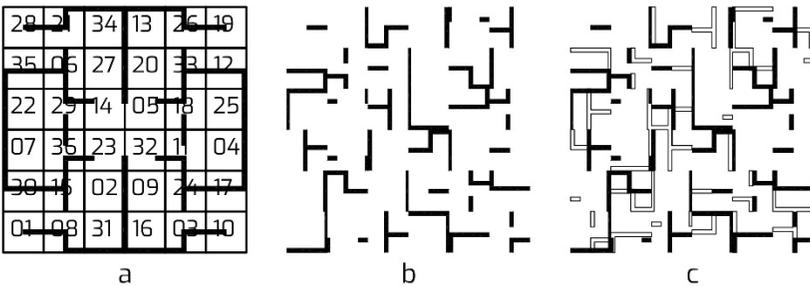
a. shows the floor plan on a numbered grid, b. shows the plan (a) rearranged based on the numbering without the grid and the numbering. c. shows the plan (b) (in black) superimposed with another floor plan (from Figure 7) (in white)
